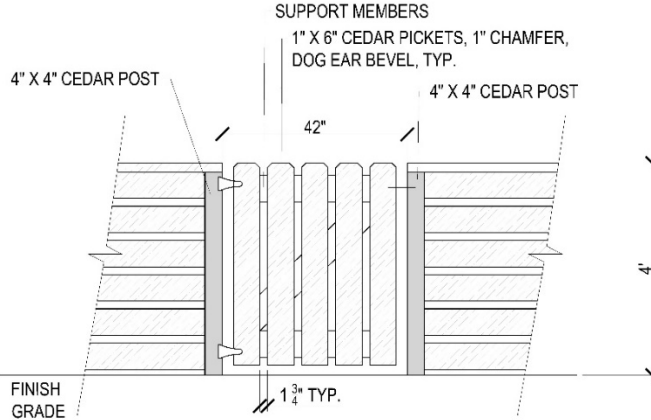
Fence Building Responsibility Plan & Details
